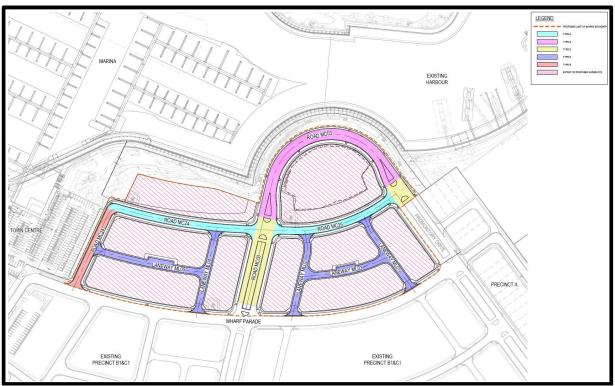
Shell Cove Boat Harbour Precincts B2/C2 Subdivision Design (Lot Layout)
